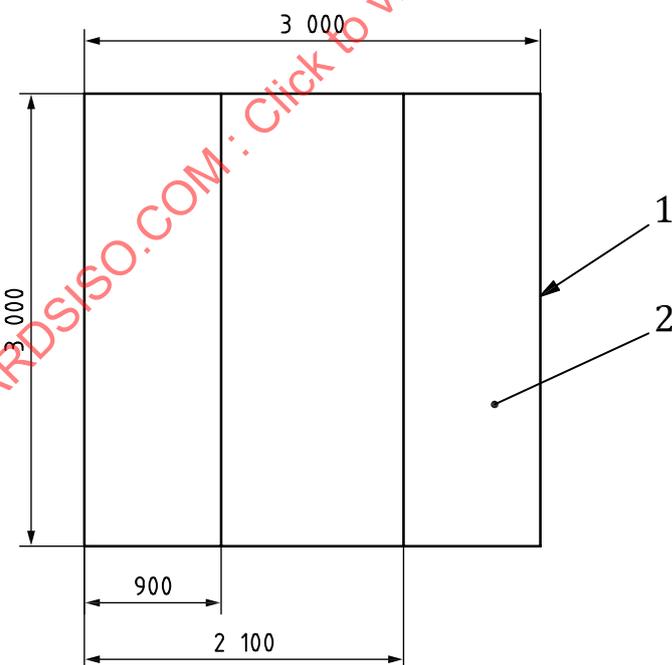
Details of horizontal supporting construction — Layout of outer layer of gypsum board
